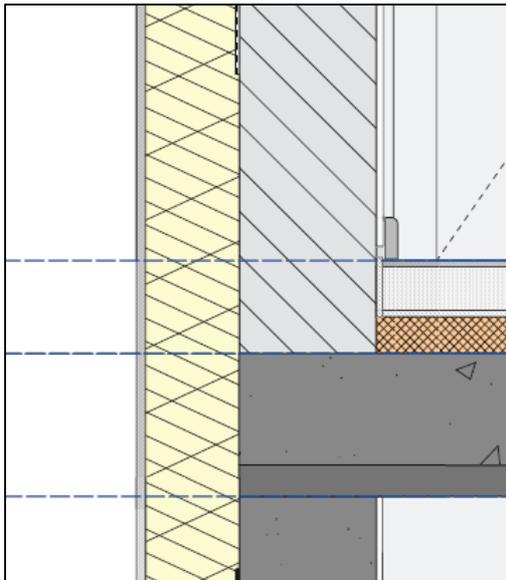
Buildup of the plaster sections. From left to right: exterior plaster, EPS insulation, concrete. (Drawing: A2RC)
